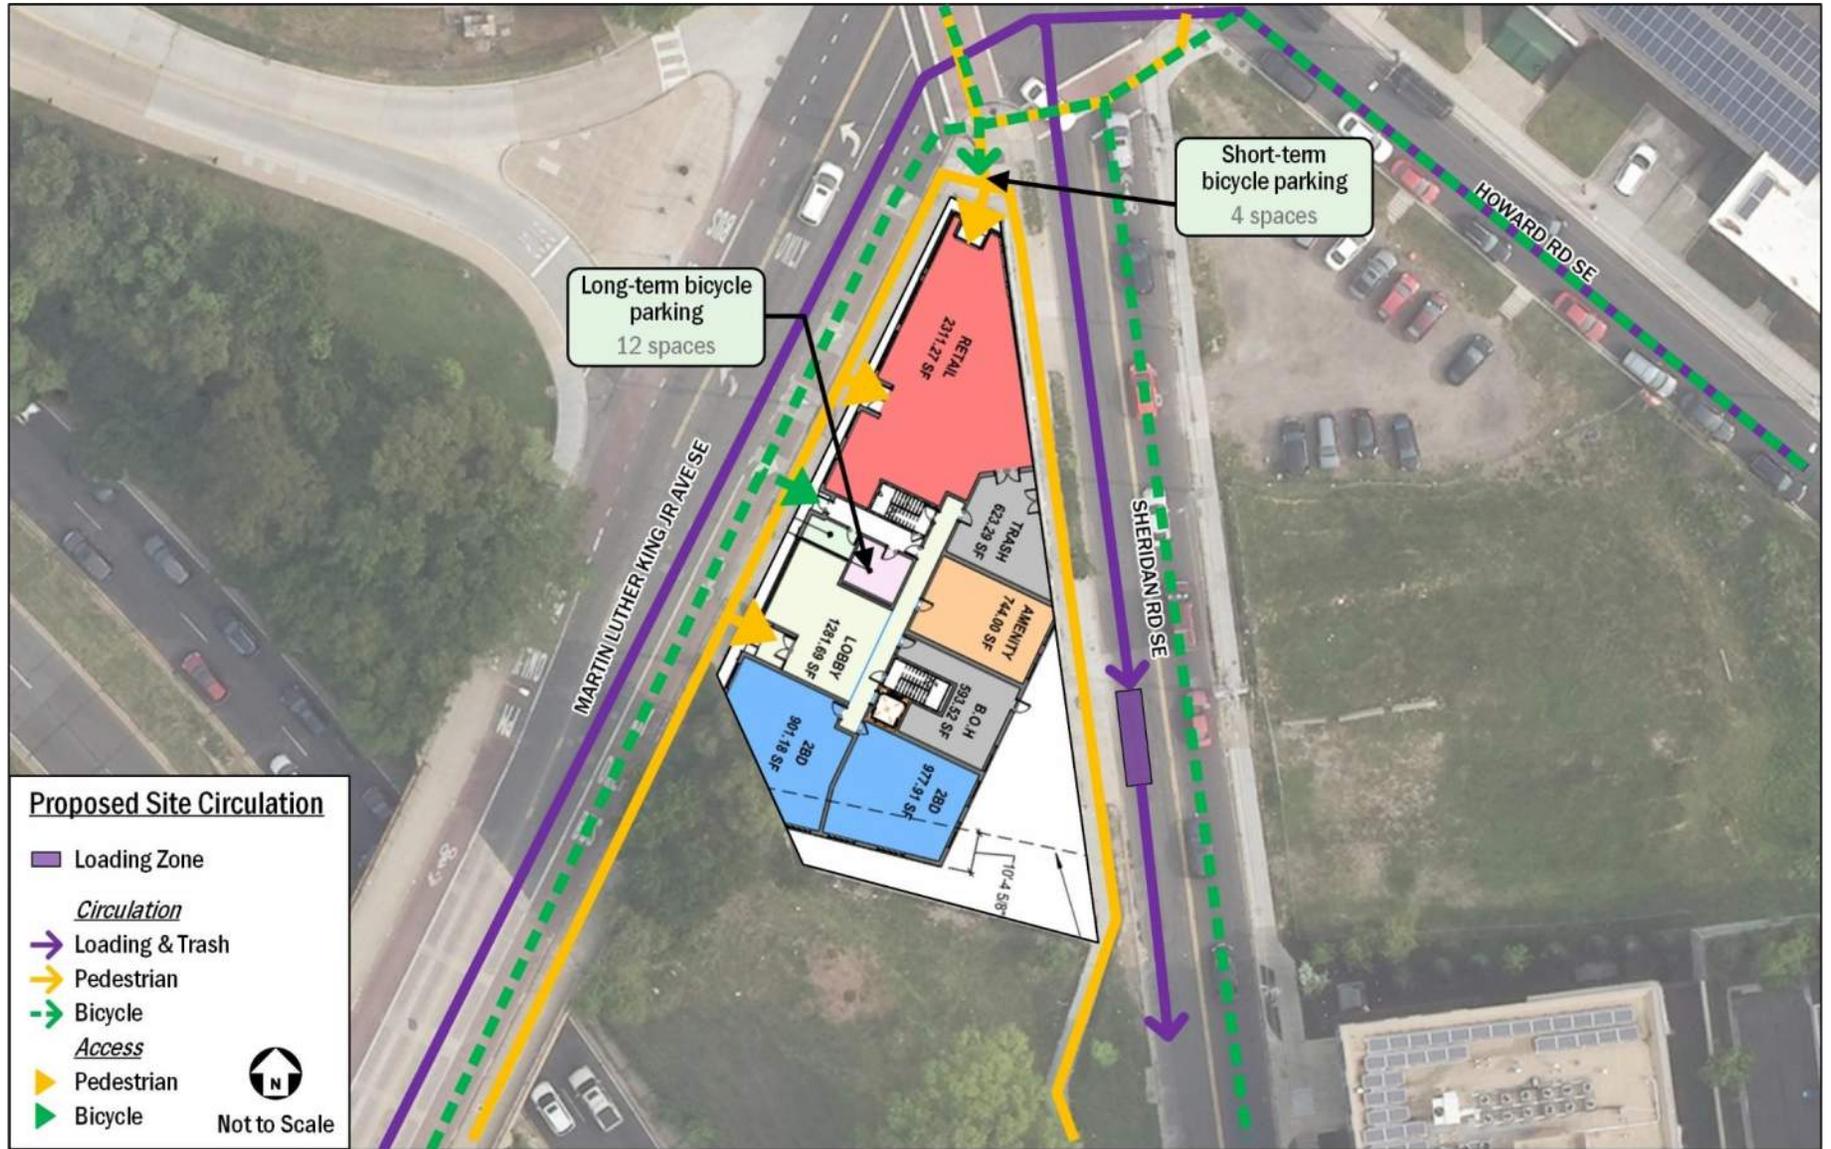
Proposed Site Plan & Anticipated Site Circulation
